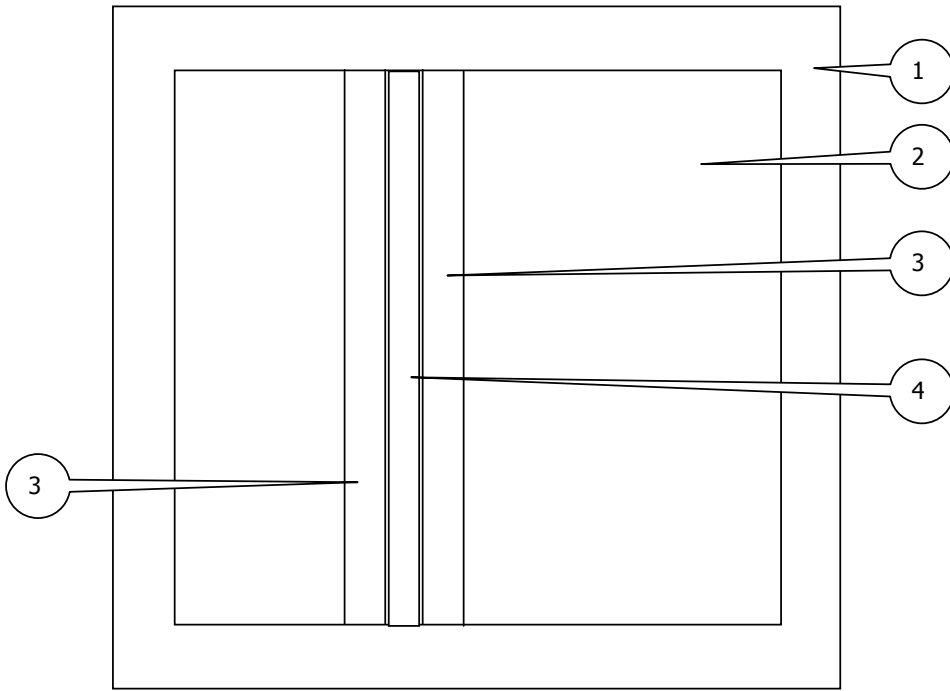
test configuration for horizontally oriented cavity barriers within walls (plan)
